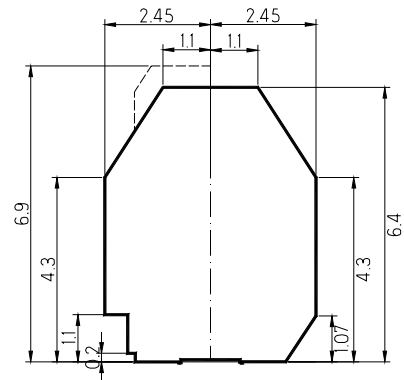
(b) Construction Gauges of Railway Crossing
